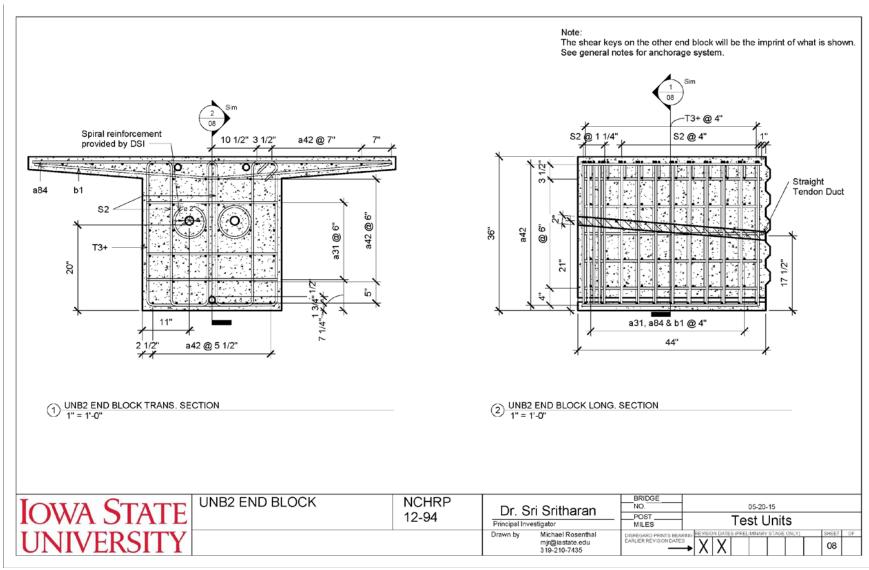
UNB2 End Block Longitudinal and Transverse Section
